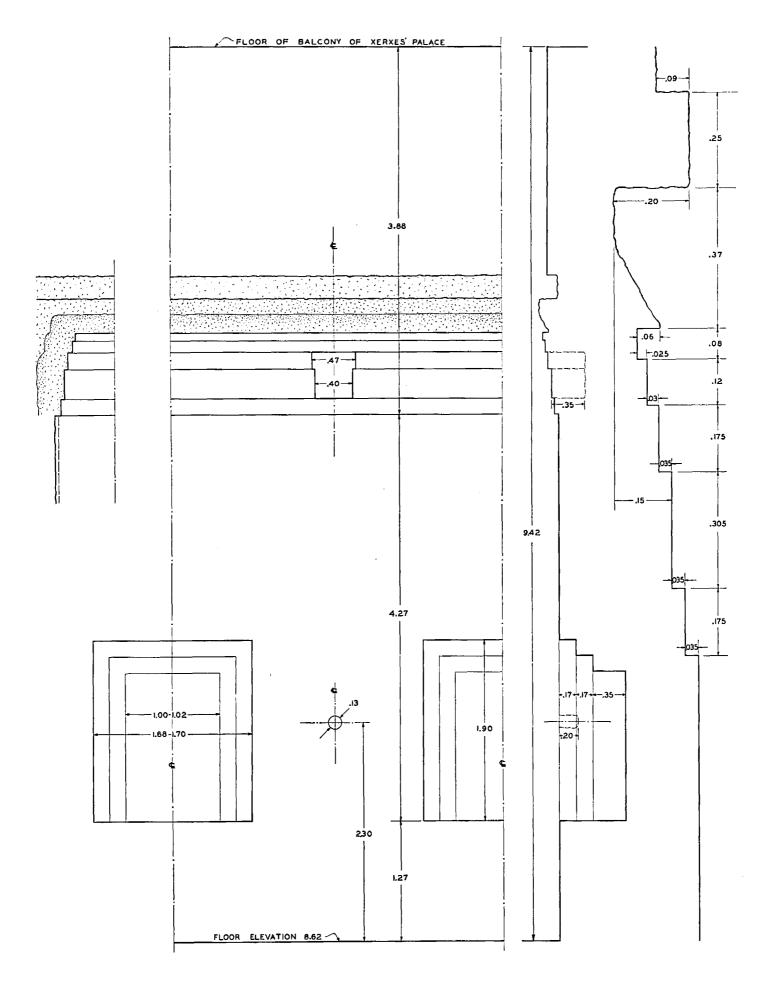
Harem. West Wing. North Wall of Room 4 Carved in Bedrock of Xerxes' Palace Platform. Scales, 1:40 (Elevation and Section) and 1:10 (Detail of Section)
